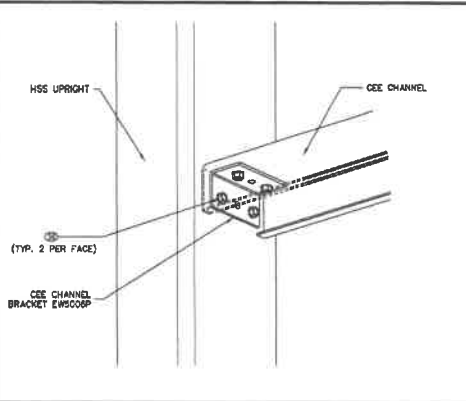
UNBRACED BAY TO UNBRACED BAY AT WELD IN WEB
